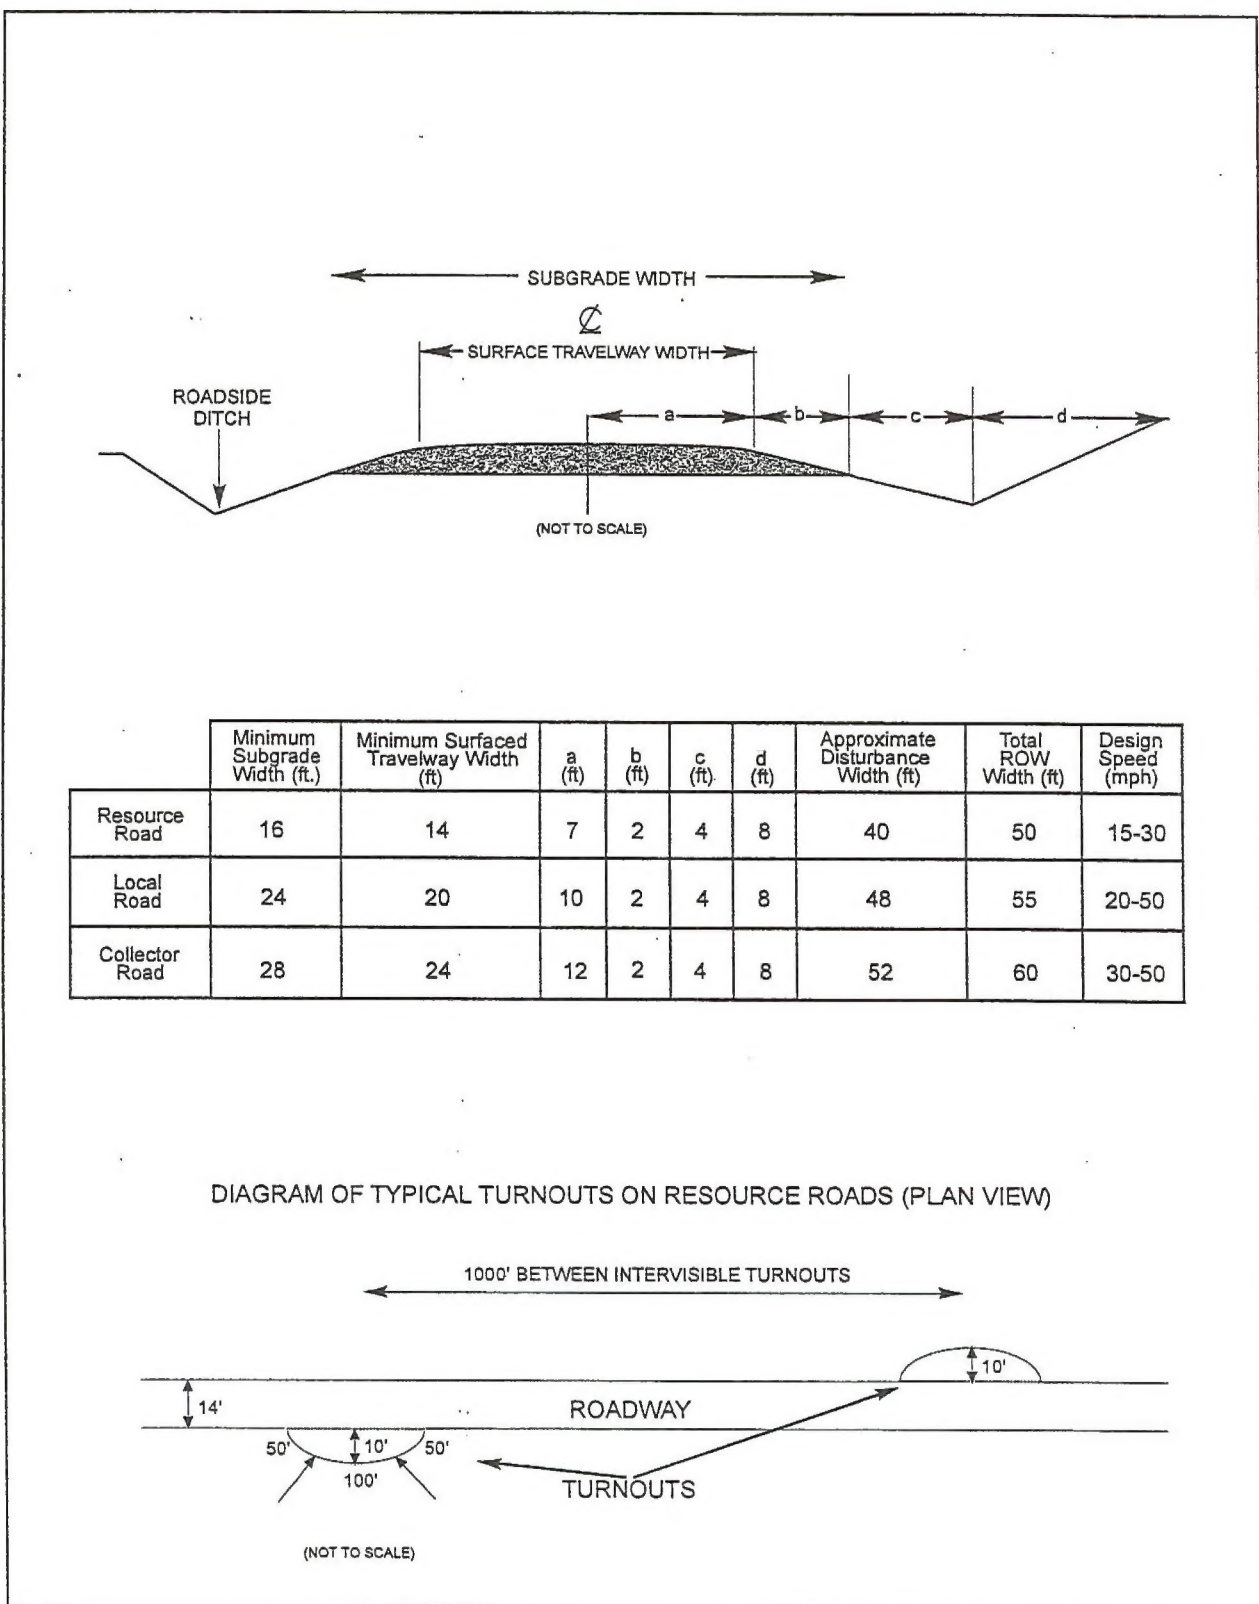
Typical Roadway Cross-Section with Width Specifications.
